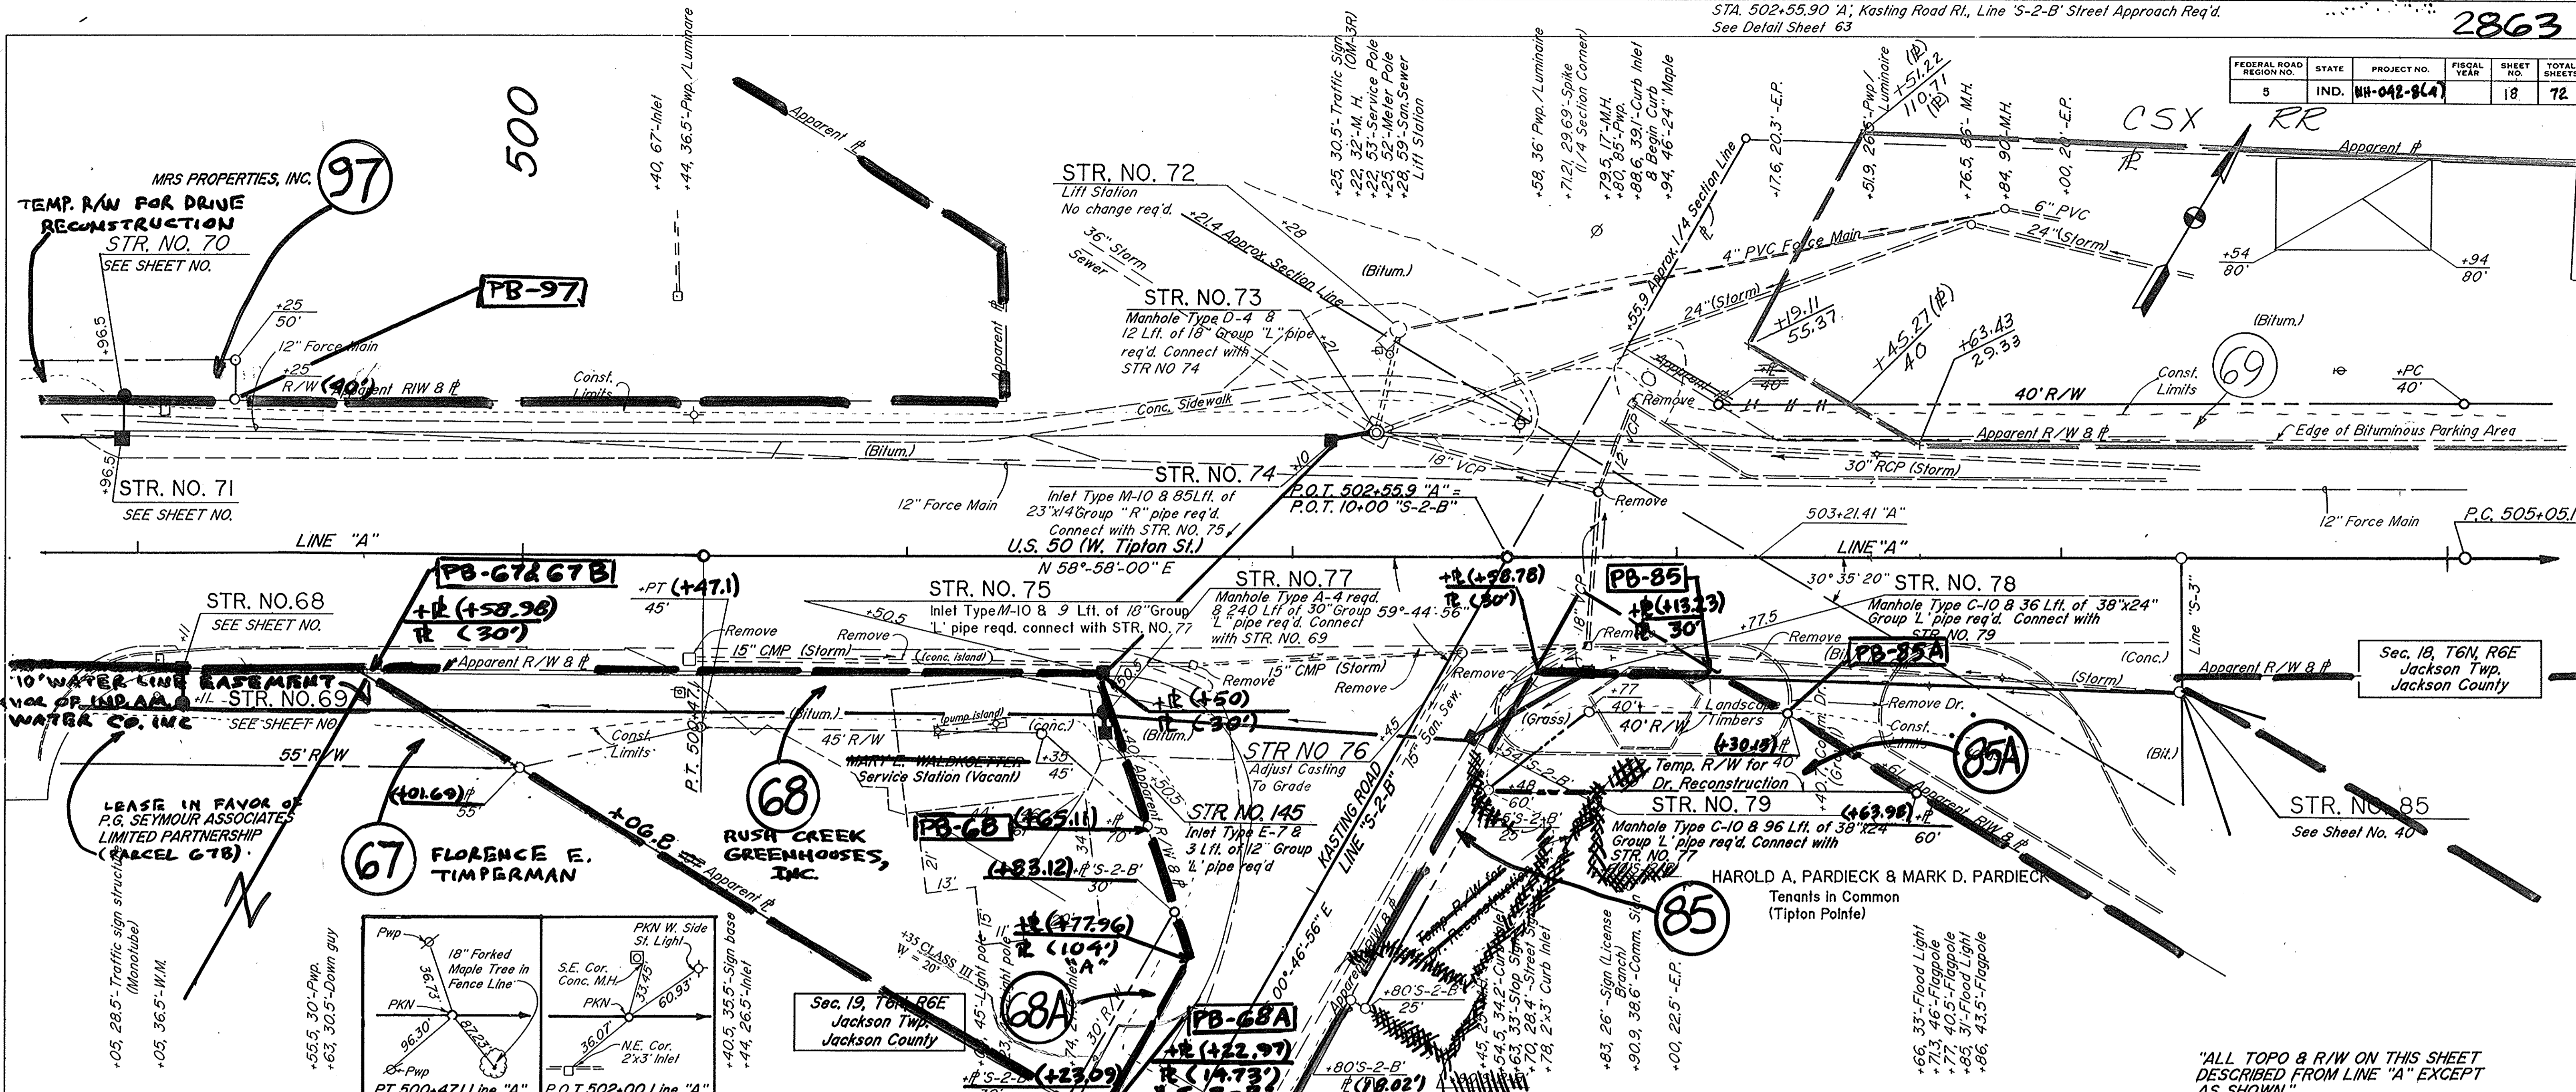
PLAN - PROFILE C & R STANDARD 1975
